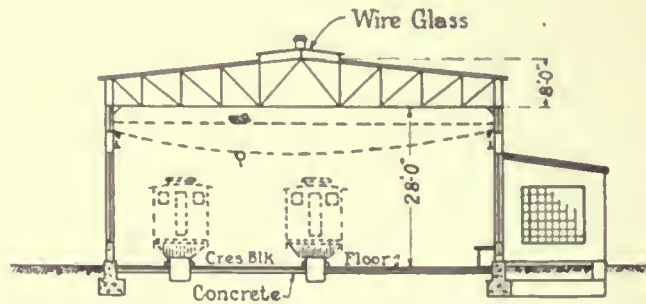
shows plan and elevations of a standard house for the care of multiple-unit cars which, in
